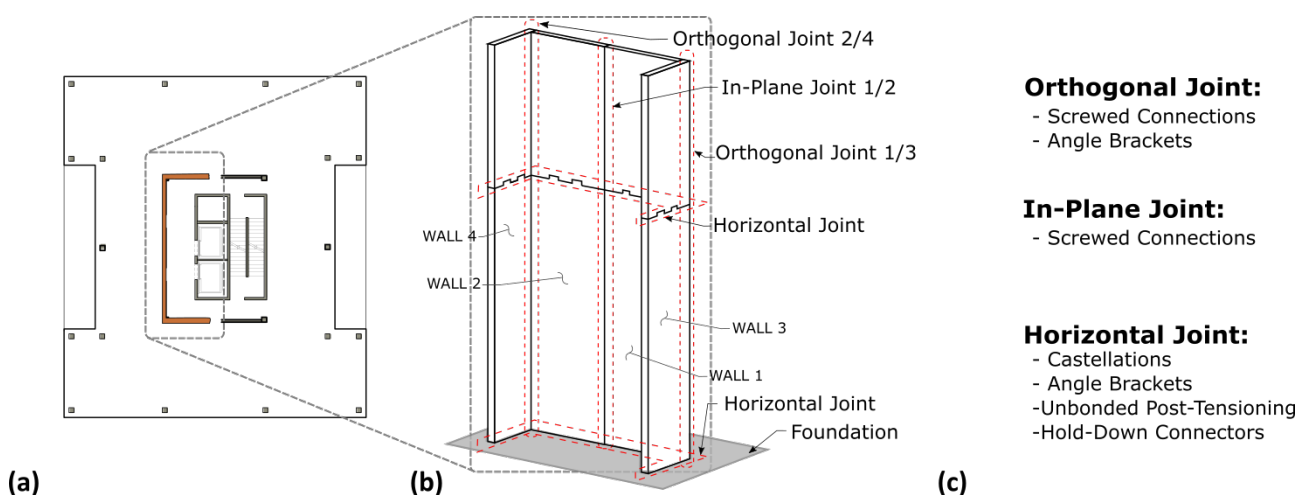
Core-wall system research plan: (a) plan view building adopted from (Green, 2017), (b) isometric of four wall core-wall system with key joints, (c) joint options investigated
